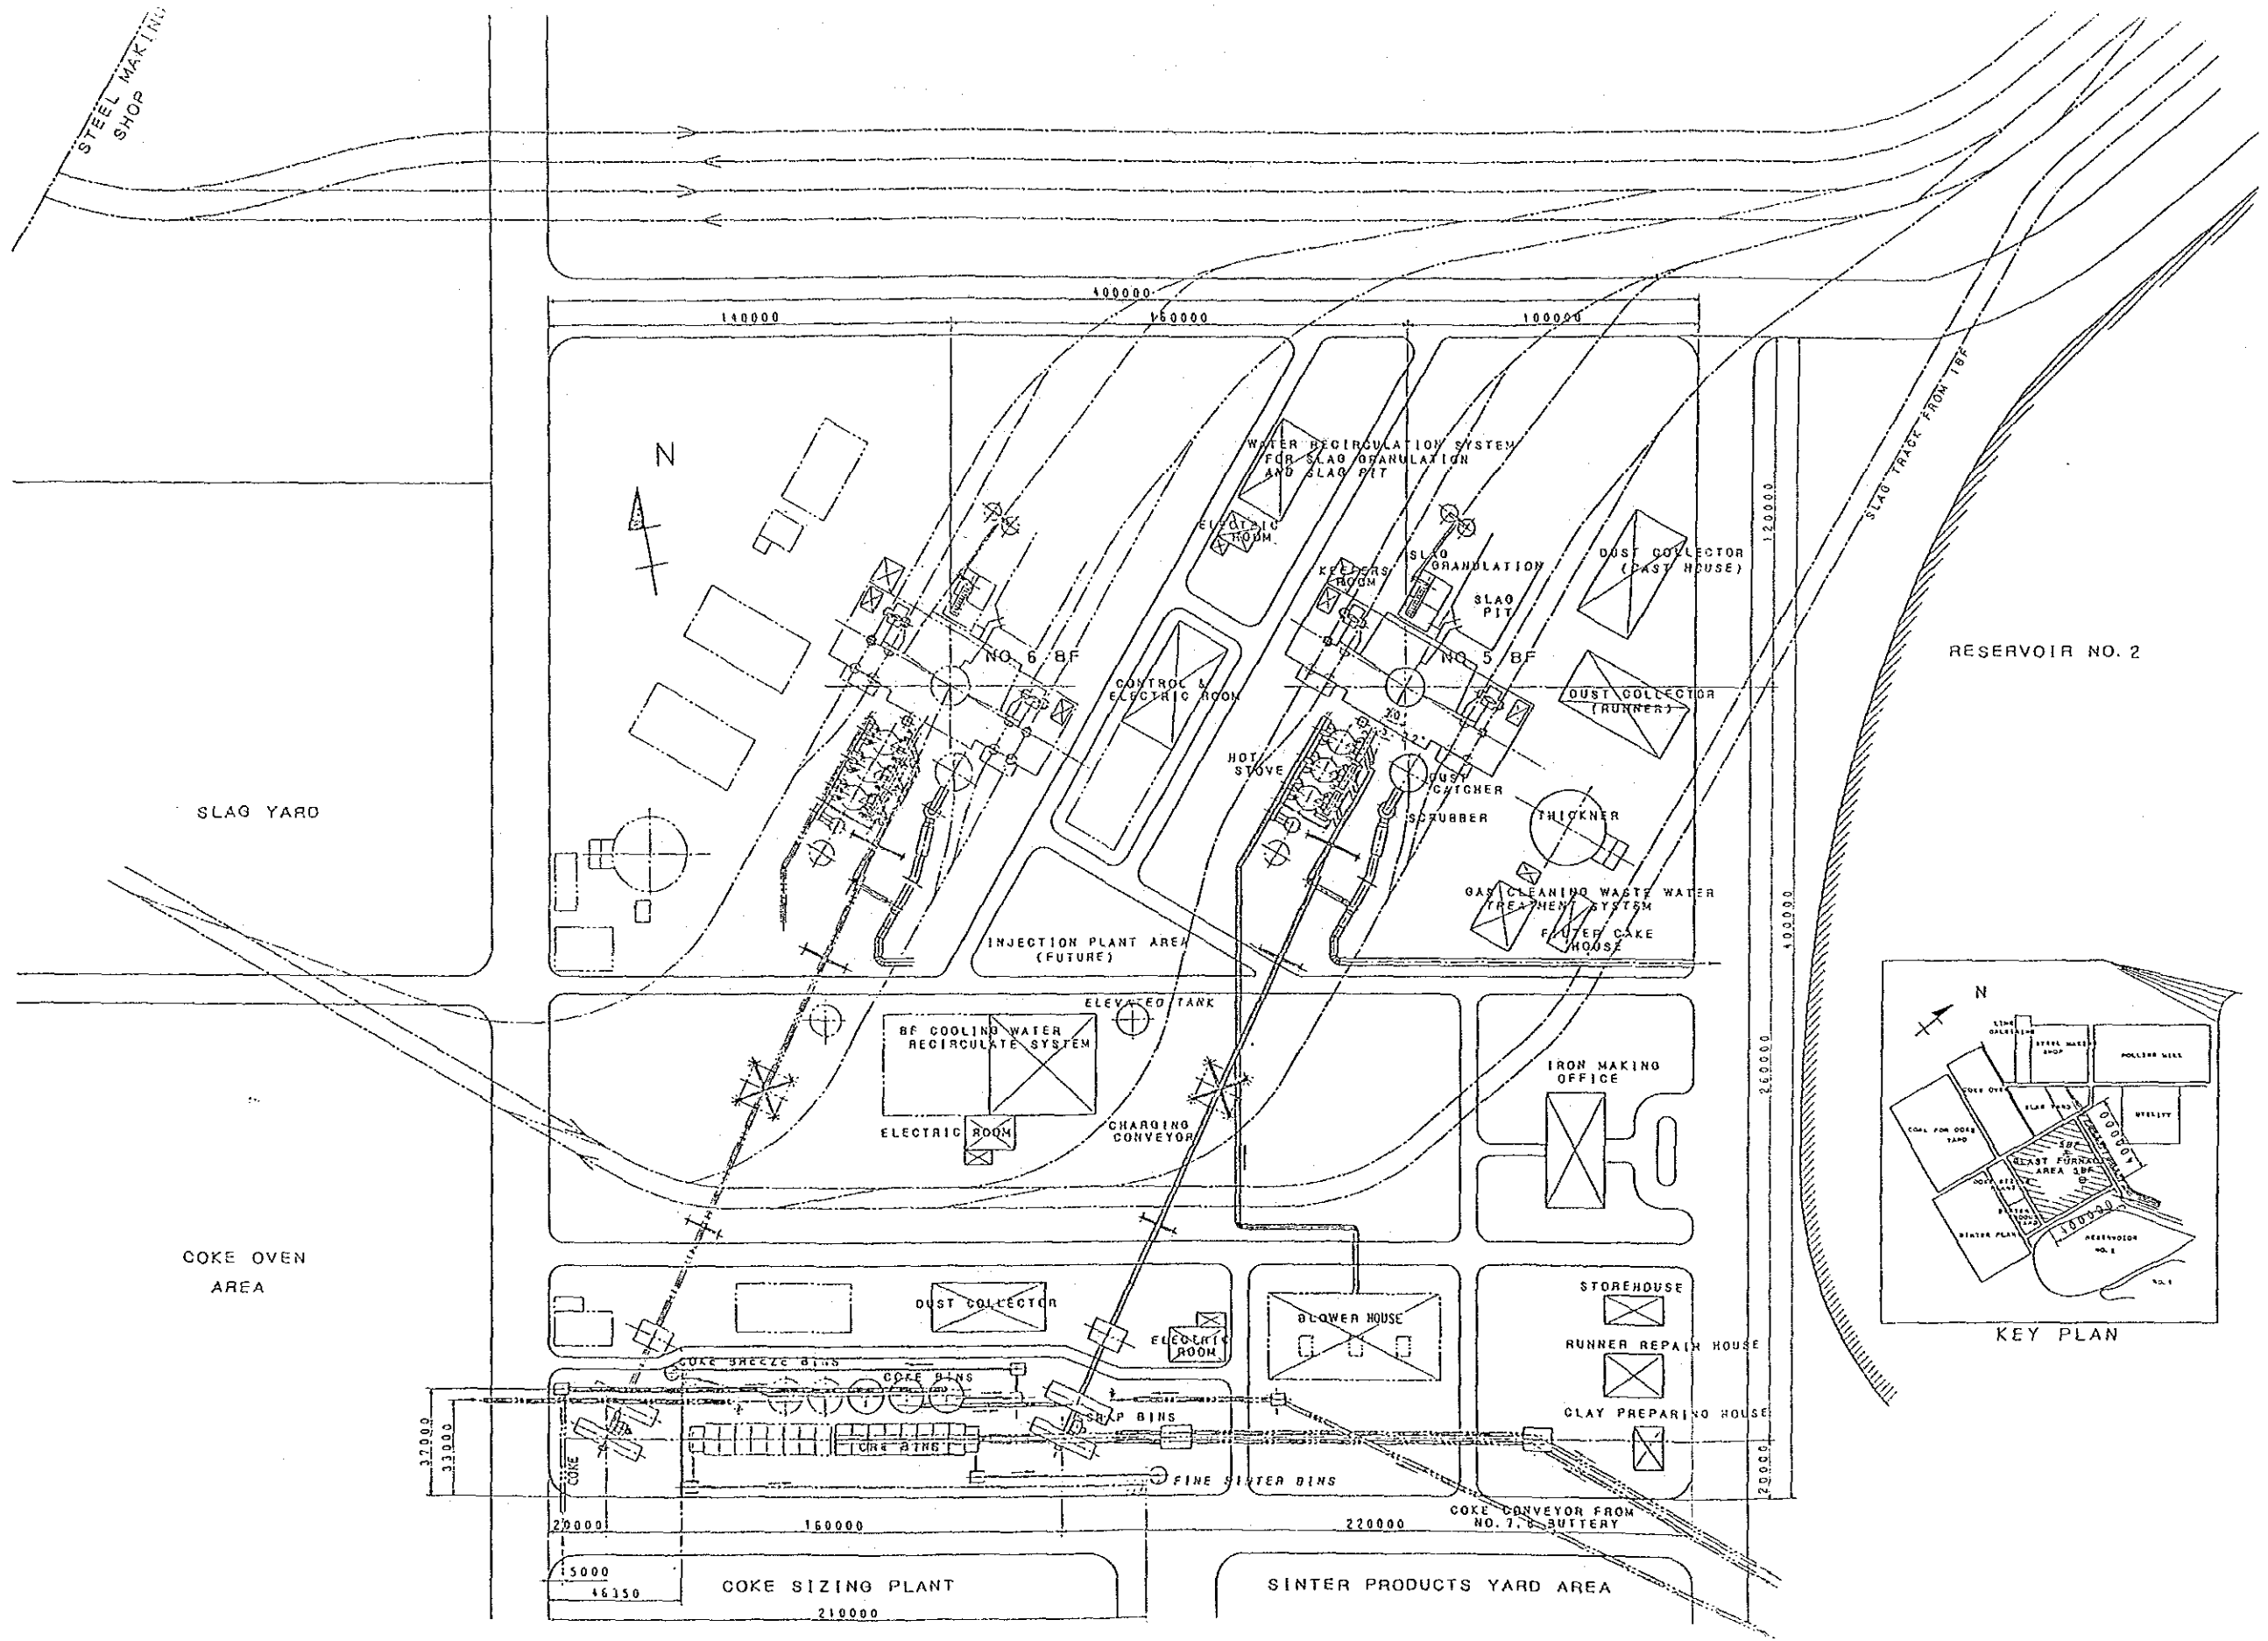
Blast furnace No.5 & No.6 general layout
